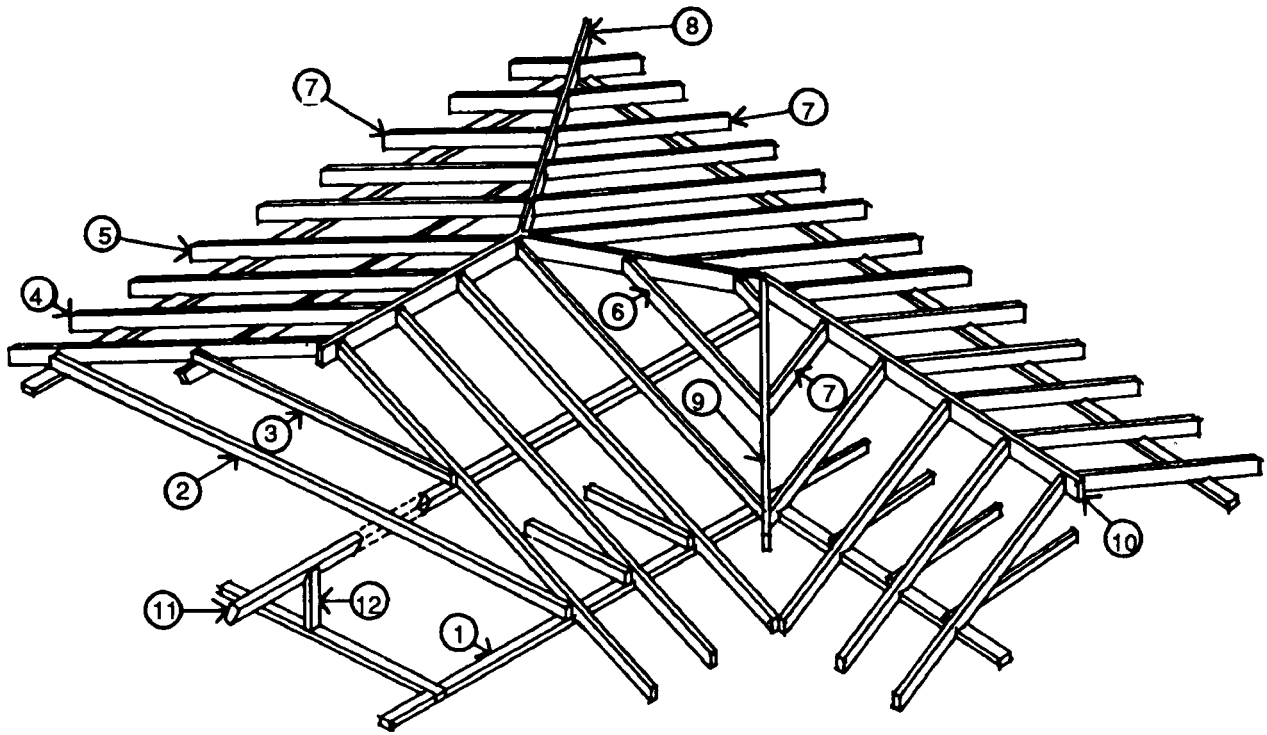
GENERAL FRAMING DETAILS FOR TIMBER HOUSES
